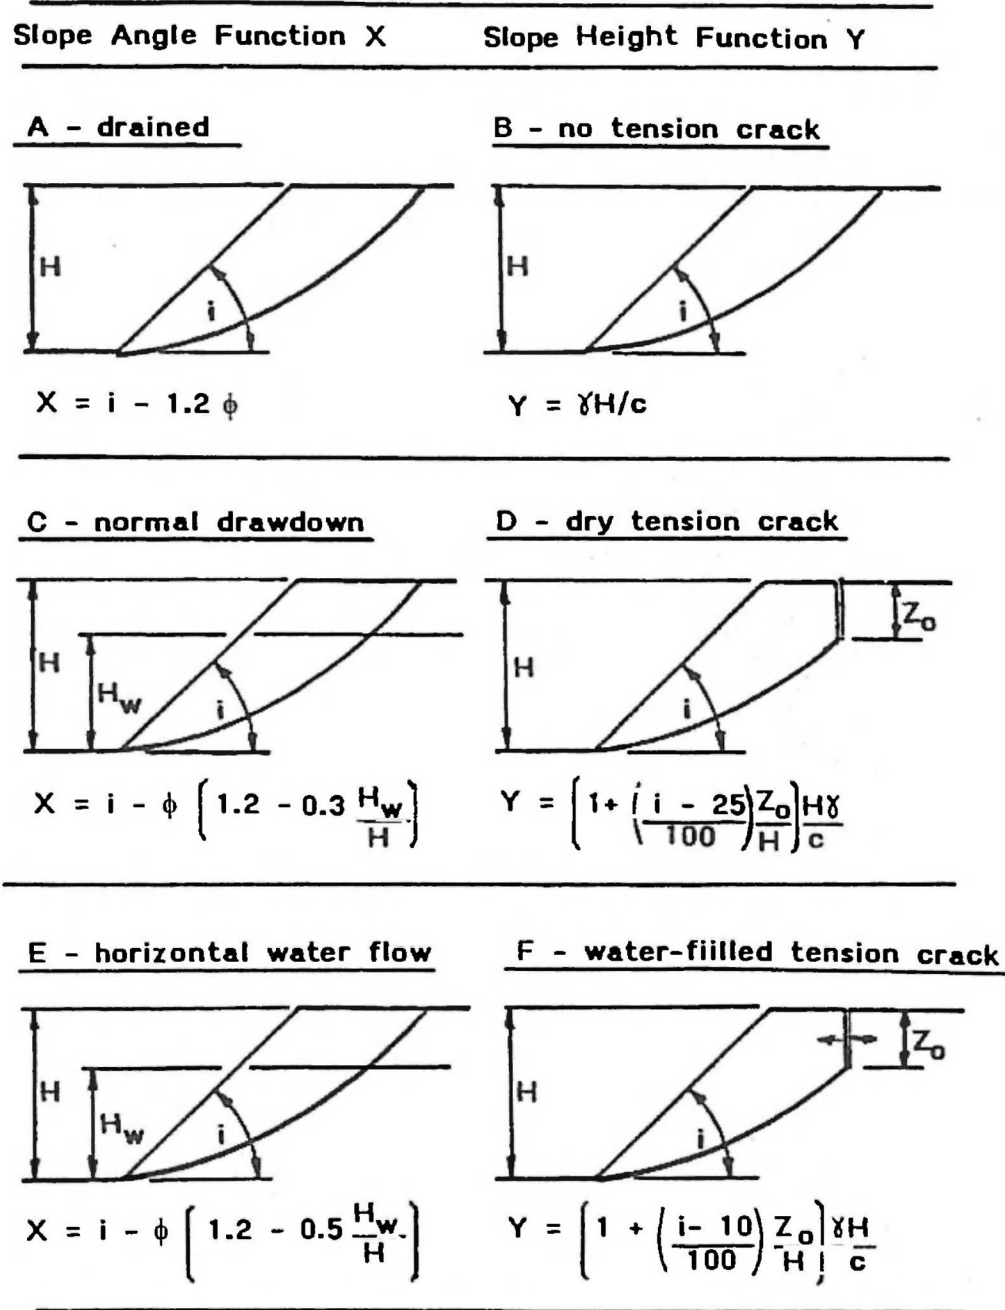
Slope angle and slope height functions for different water and tension crack conditions (Hoek, 1970a).
